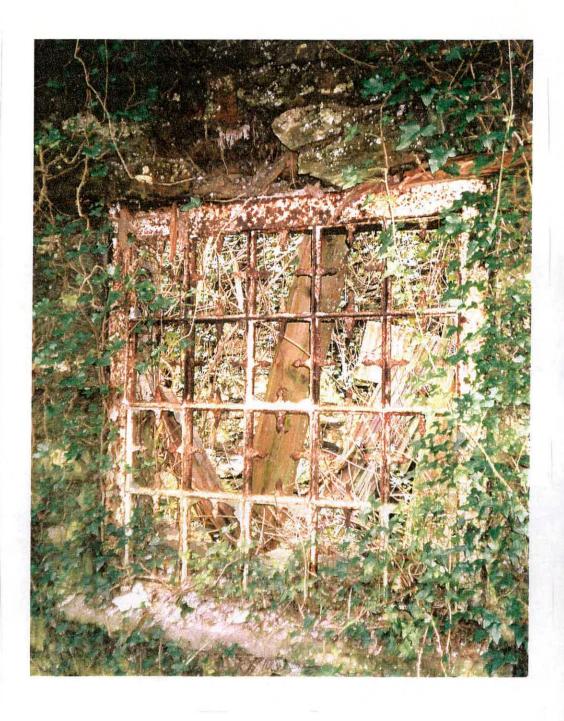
Cast-iron window frame in the Brass and Bolt Shop, 2002
